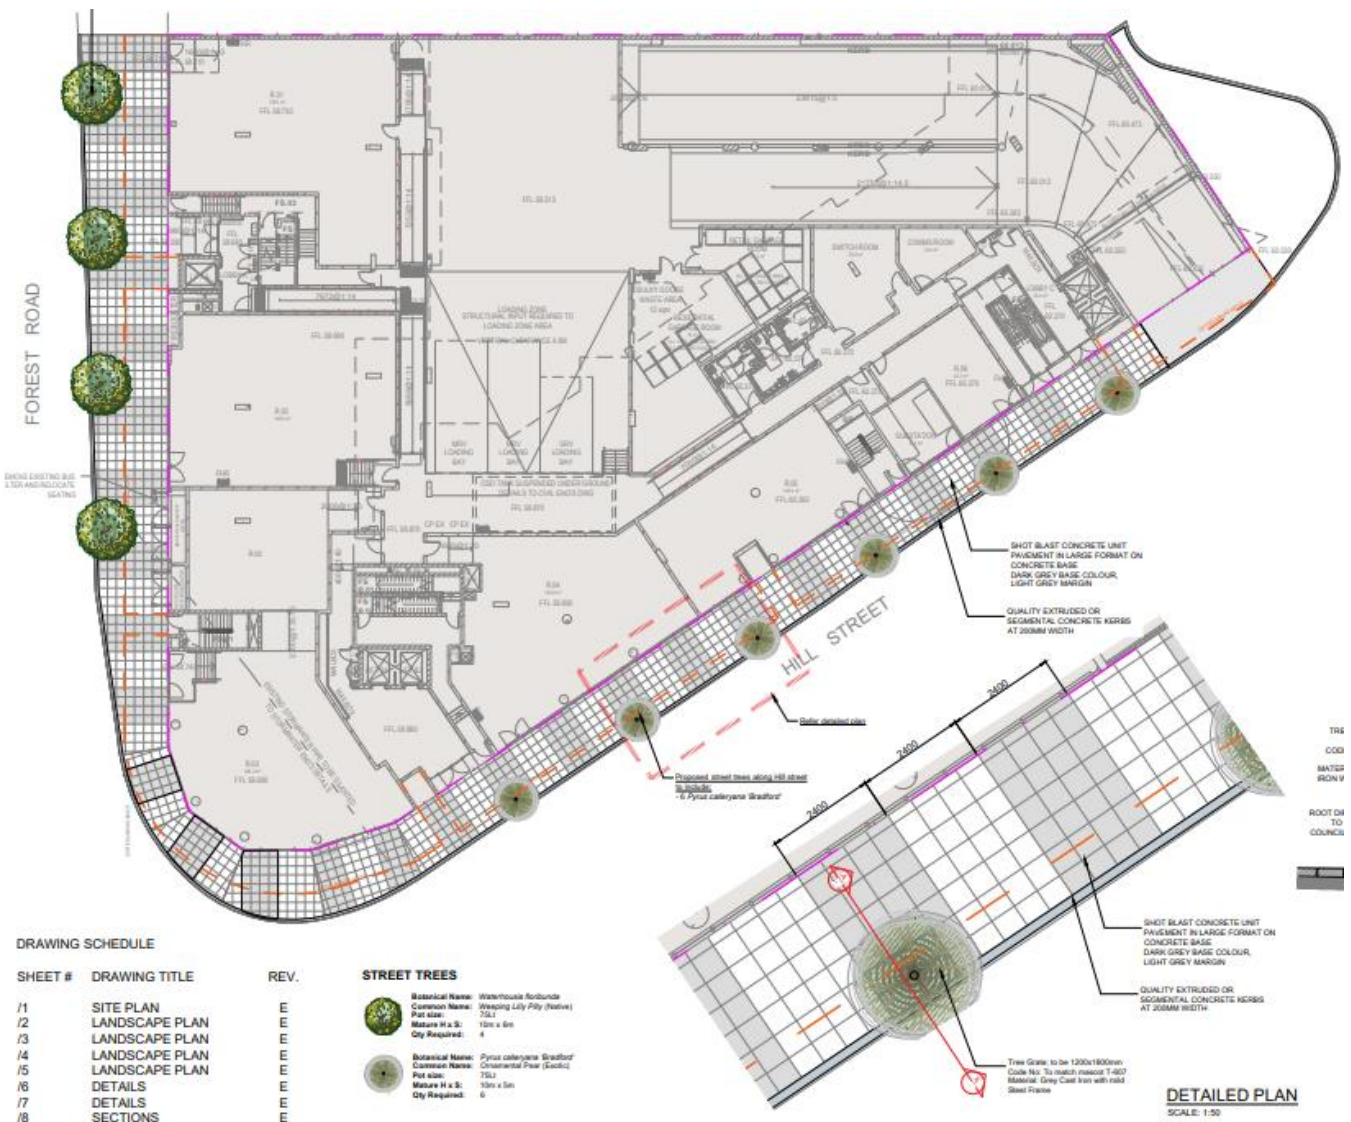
Public domain landscape plan showing landscaping at the ground level (Source: Concept Landscape Architects, 2025)
